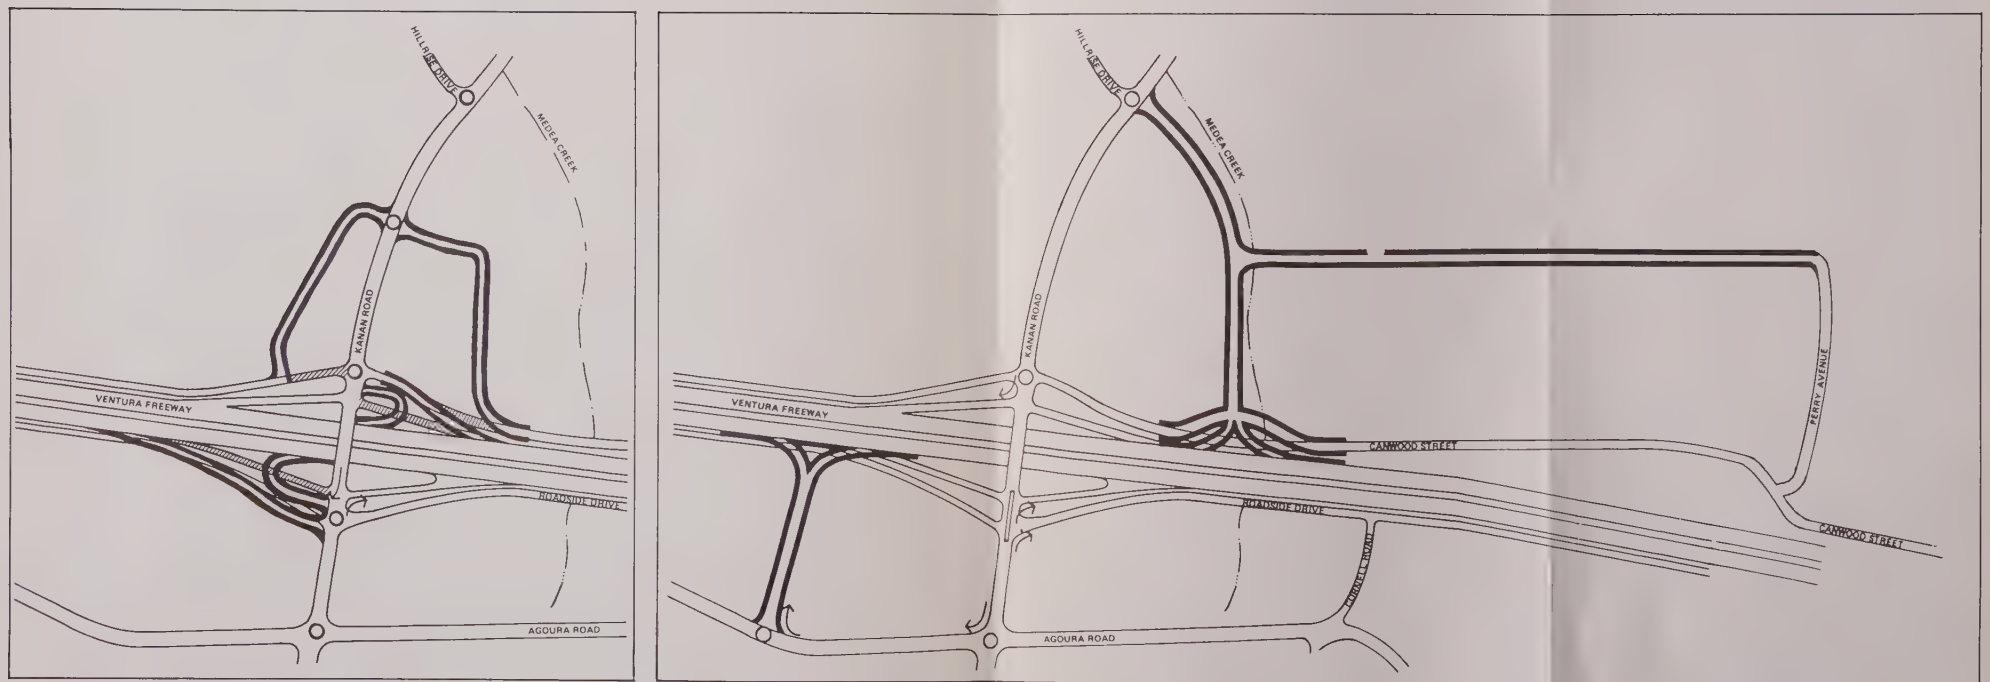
Conceptual Freeway Ramp Improvement Alternatives for Kanan Road
